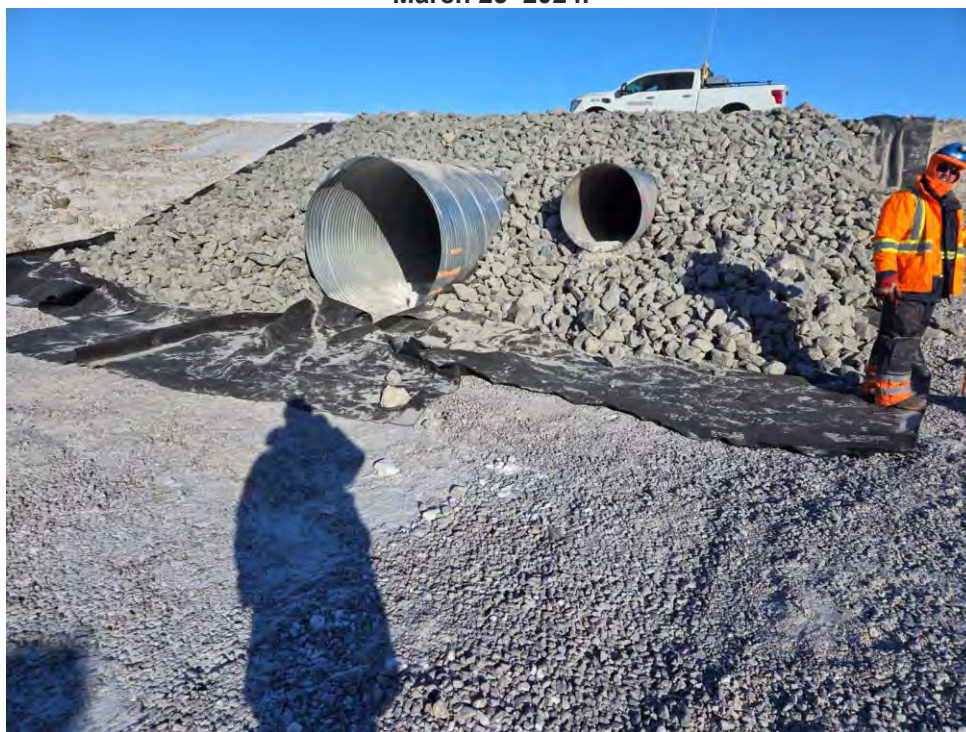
Placing geotextile and riprap on west side slope at CV-059. Photo taken March 25, 2024.
